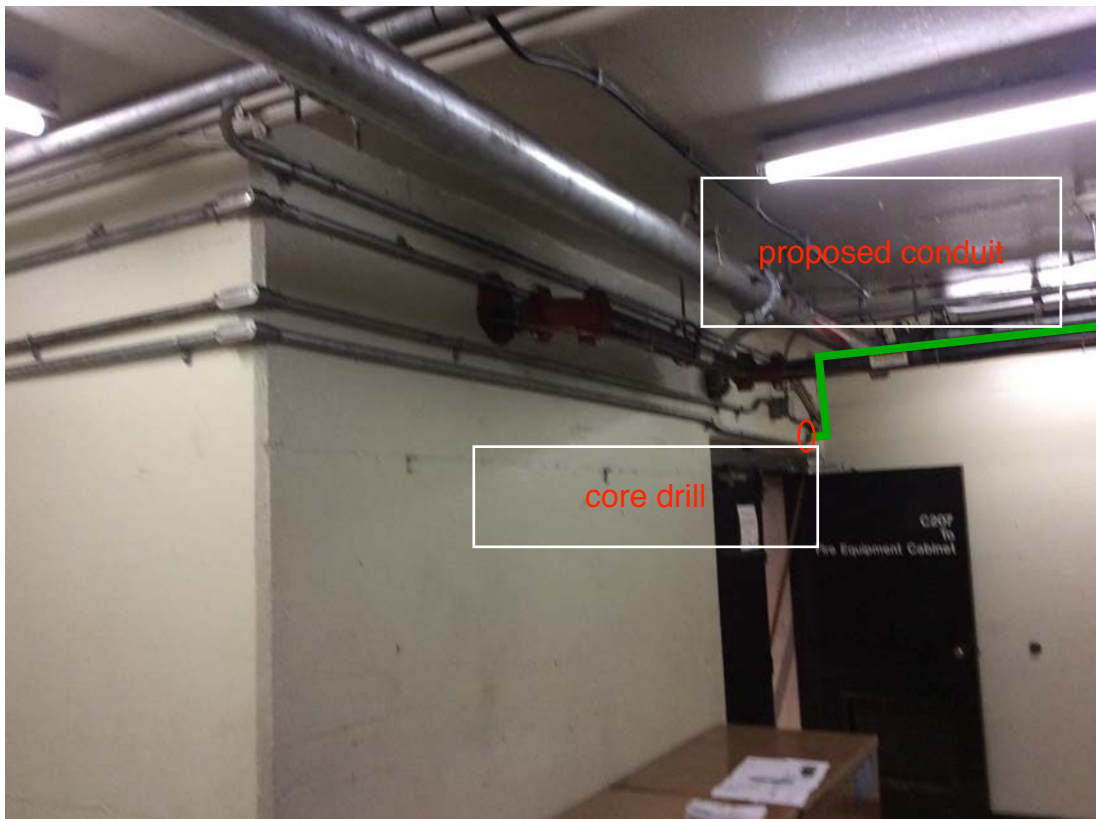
D05 Capitol South: Proposed overhead conduit and existing in floor duct runs
